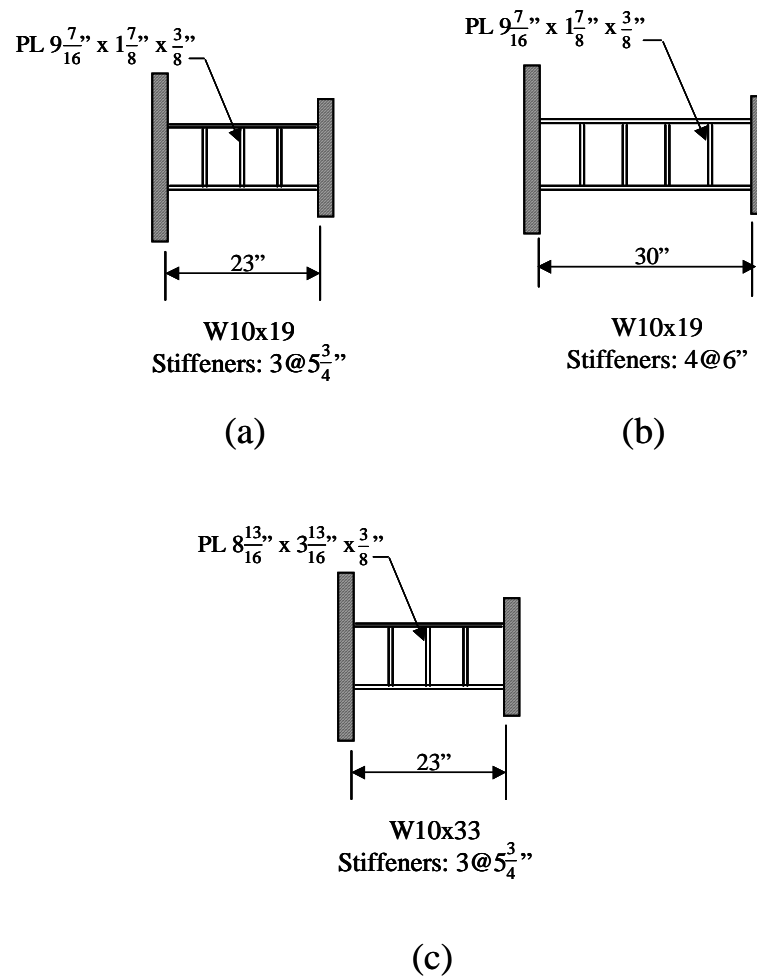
Welded Steel Link Beams Tested by Arce (2002)
